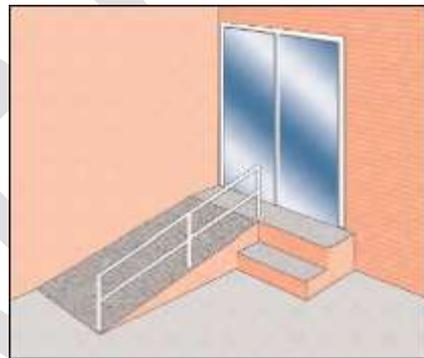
Accessible entrances where a level site entrance cannot be provided
